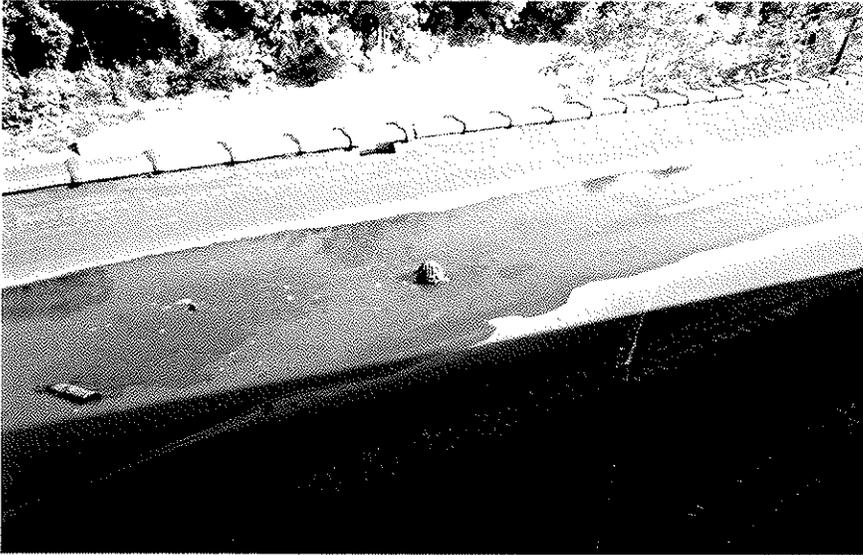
(top): Coping at east façade wall. Note overflow opening and presence of standing water.
